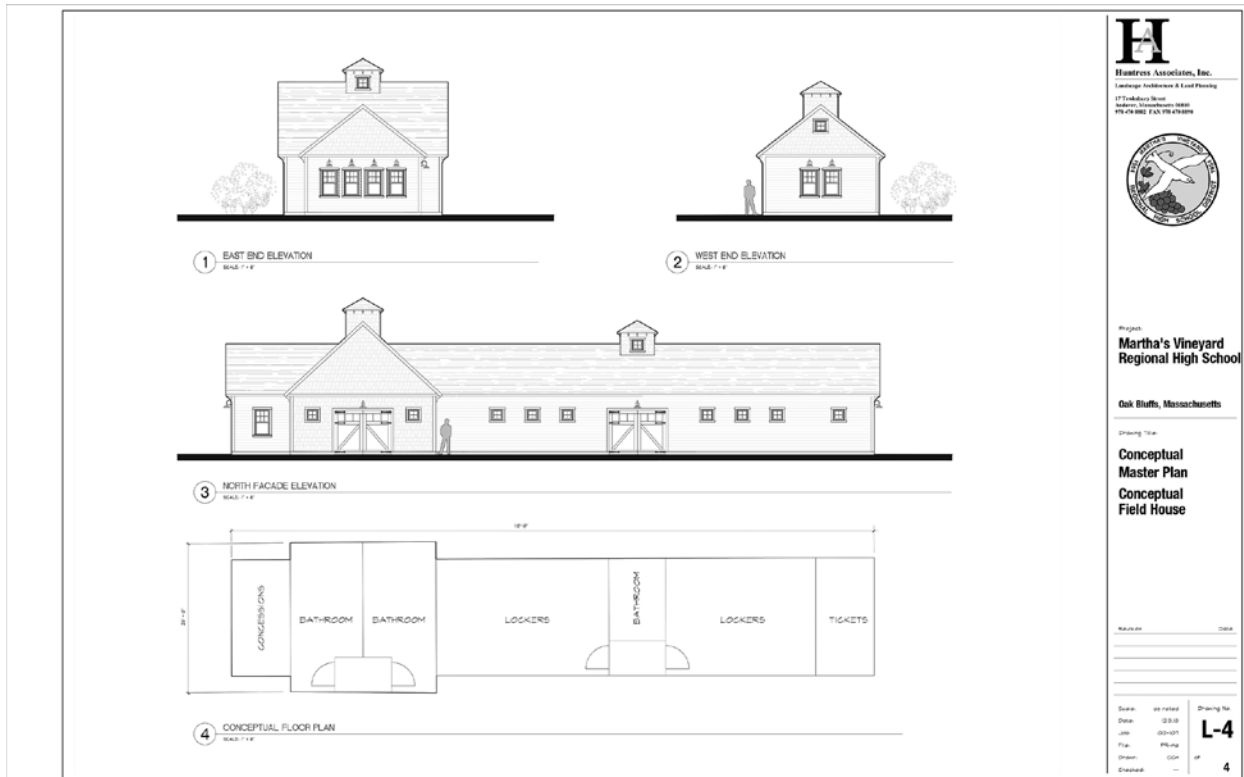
Athletic Field Master Plan – Conceptual Field House Plans
